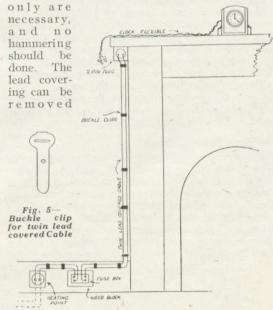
Wiring scheme from Heating Plug to Electric Clock
